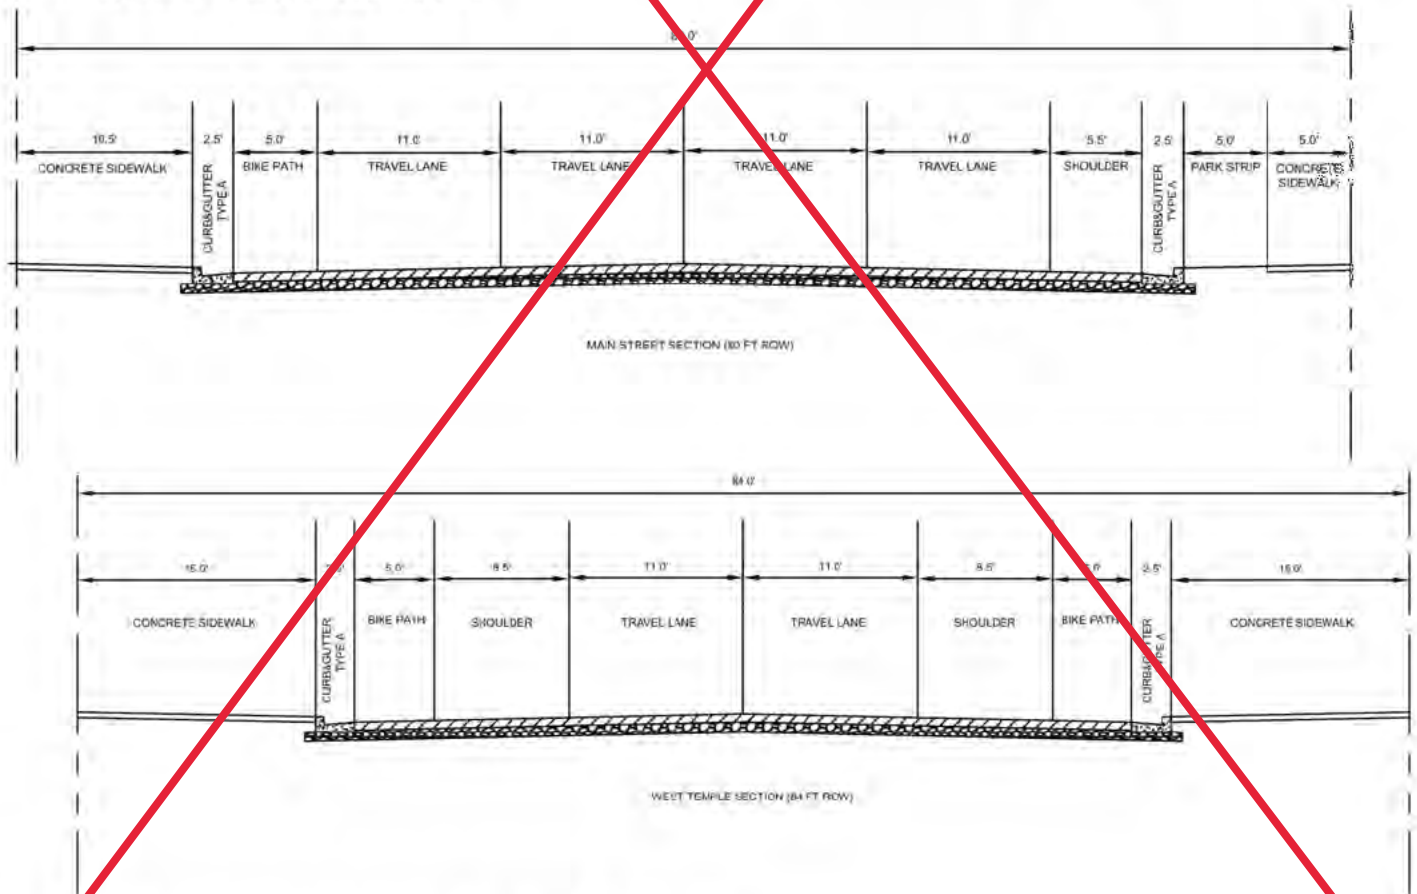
(1). Typical Cross Section Avenues (Main Street and West Temple)
